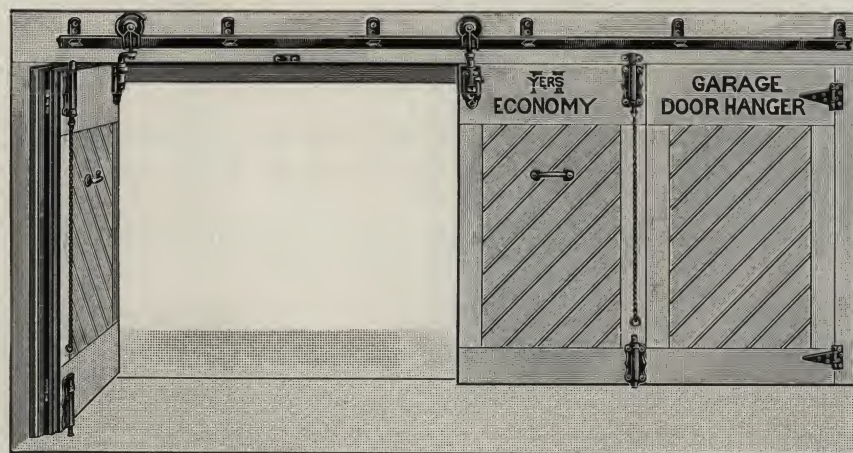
illustrates the Myers Economy Garage Door Hanger as used on four doors in pairs—each pair of doors hinged to side of Door Post. By placing the Track flat against Door Header or Top Casing,
